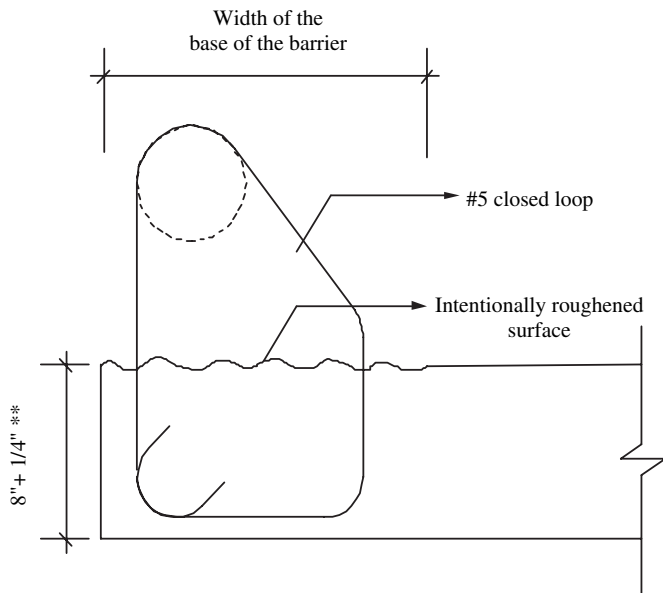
Detail H, panel-to-barrier connection detail (1/4-in. is used as a sacrificial layer for texturing).
